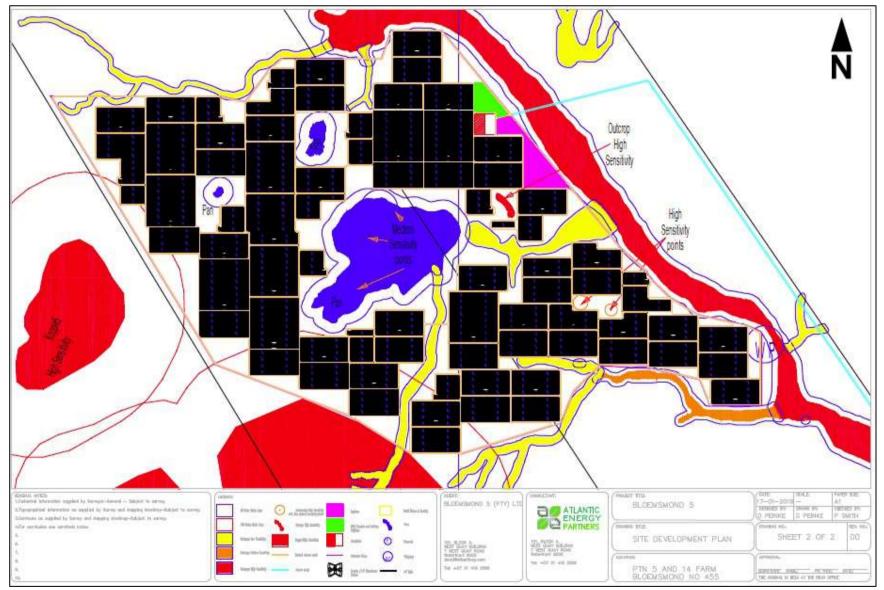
Proposed site layout plan for the preferred development option (Bloemsmond PV 5)
